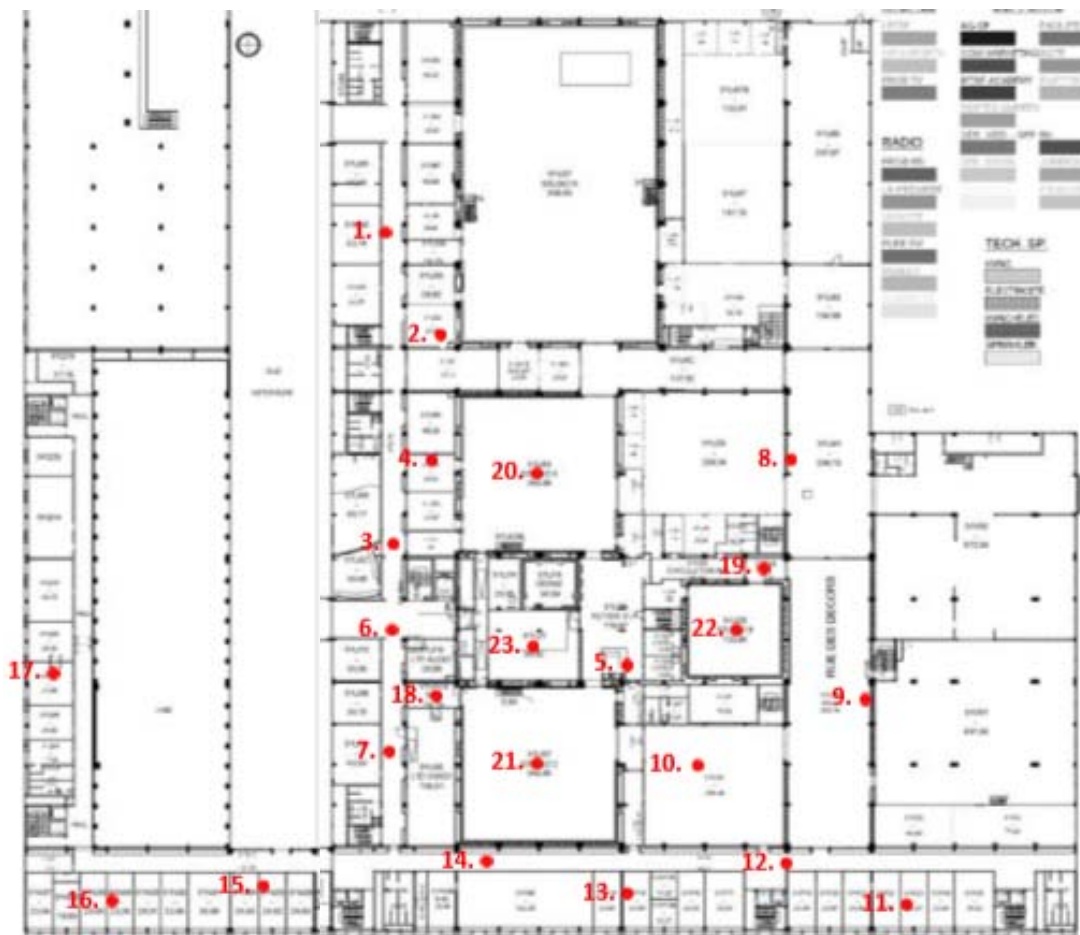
Placement Access Points for Floor 1 in Building CHJM
